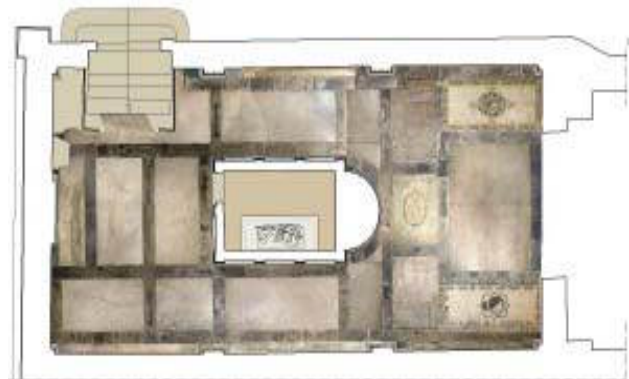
Plan with photo-mosaic (original drawing on scale 1:20).
